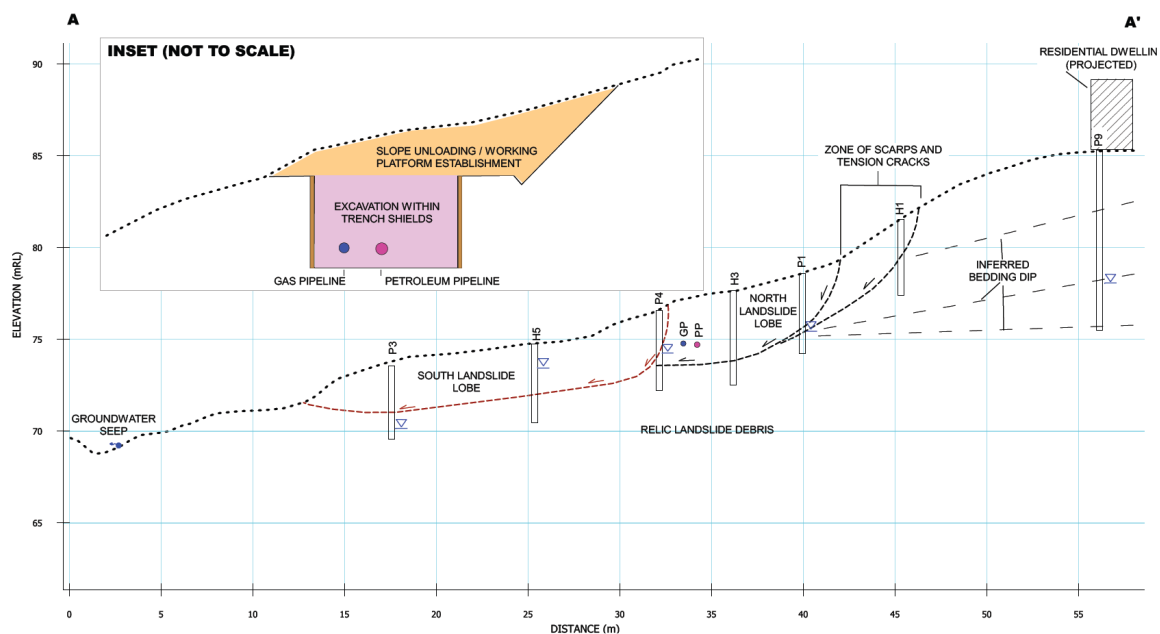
Engineering geological cross-section. Refer Figure 2B for section location. Inset: Simplified schematic of PSRT excavation methodology.
